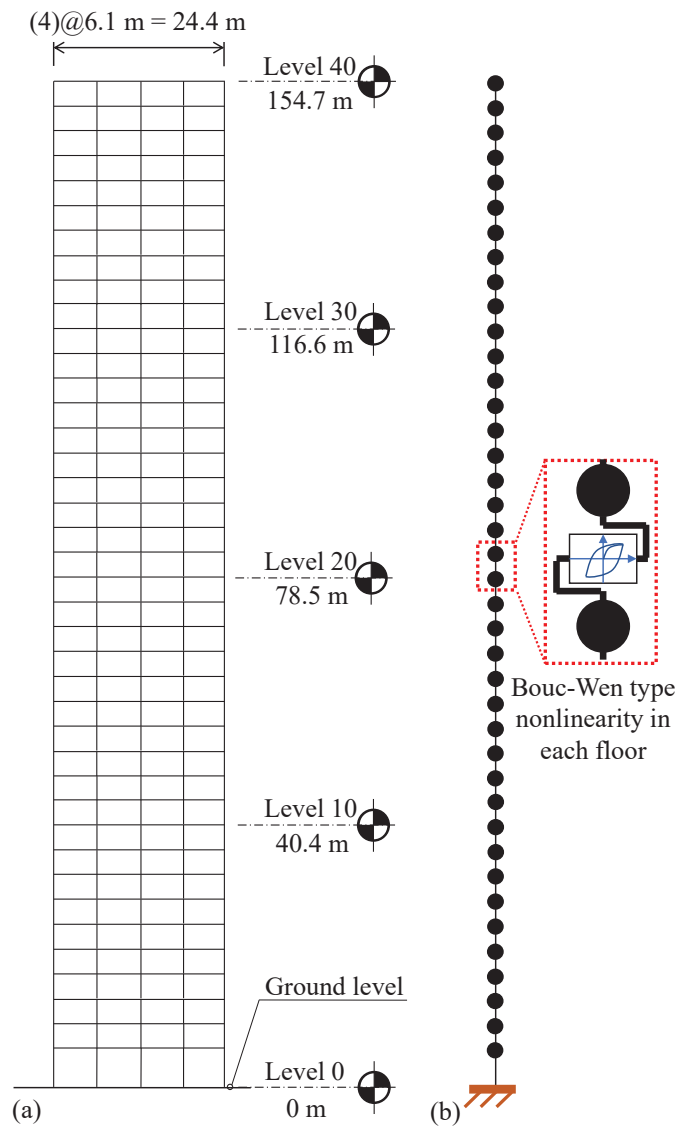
The 2D steel frame with Bouc-Wen type nonlinearity: (a) structural layout; (b) the shear building model.
